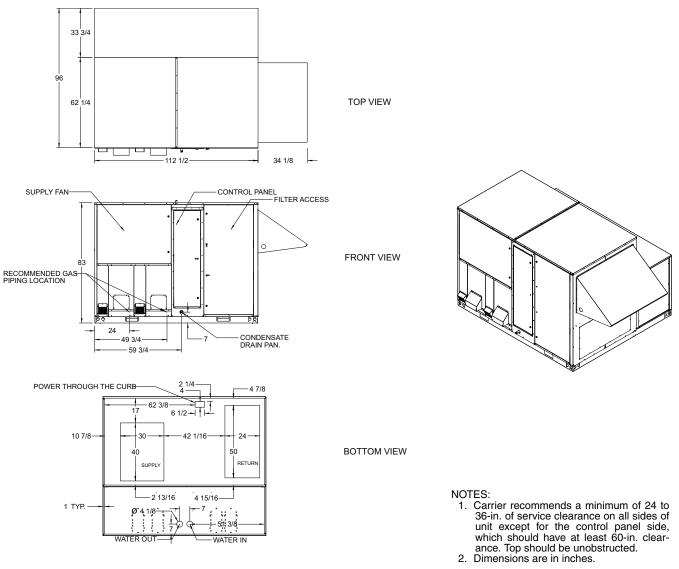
Unit Dimensions — 62RA,RB22-38 Standard Units
